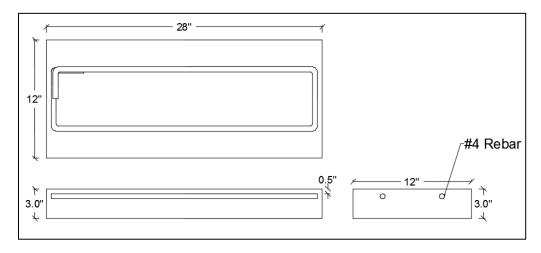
Schematic of the Slab Specimen Designed for Corrosion Testing
